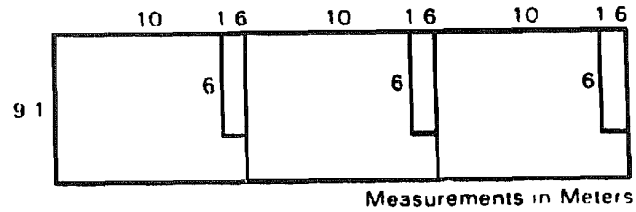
Floor Plan of a Multi-Family Residential Structure
